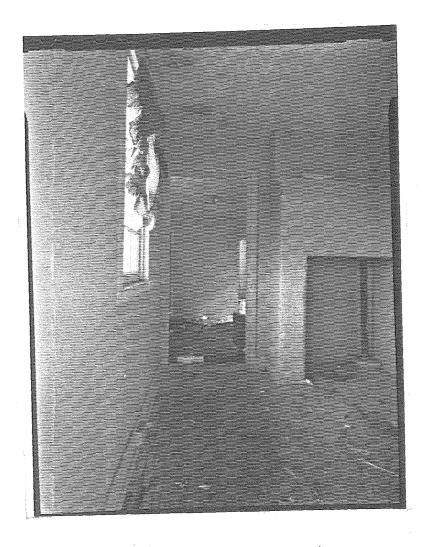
111-113 Ice Street, first floor: view from the northwest kitchen wing looking east.
